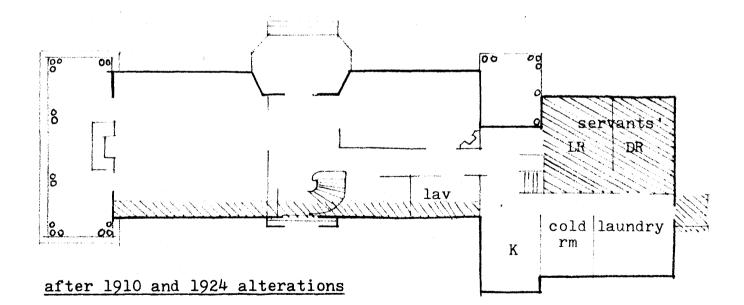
J.H. WHITTEMORE SUMMER RESIDENCE GROUND FLOOR PLAN
